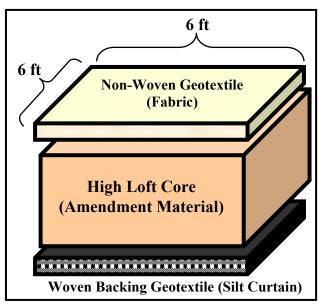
Construction diagram of small-scale geotextile test mats.
